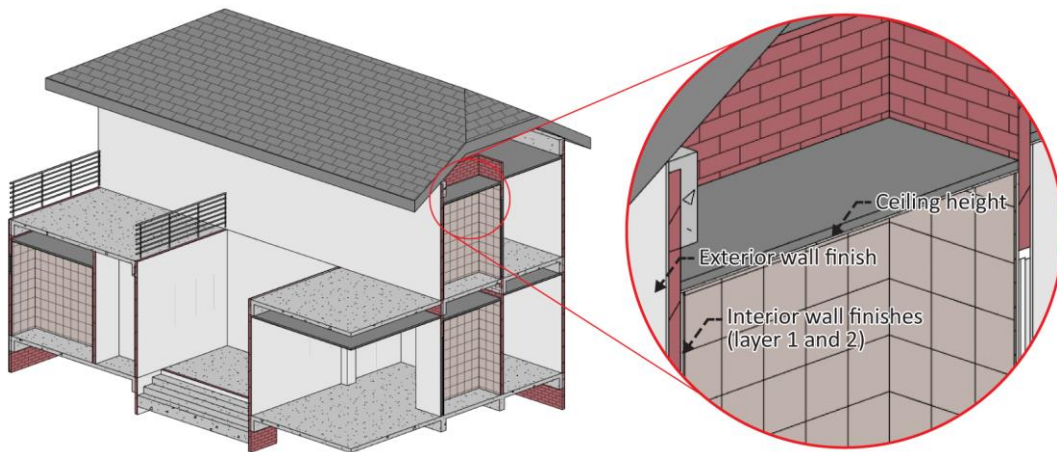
Example of the BIM model after the walls that are exterior and interior wall finishes have been recreated (process 3).
